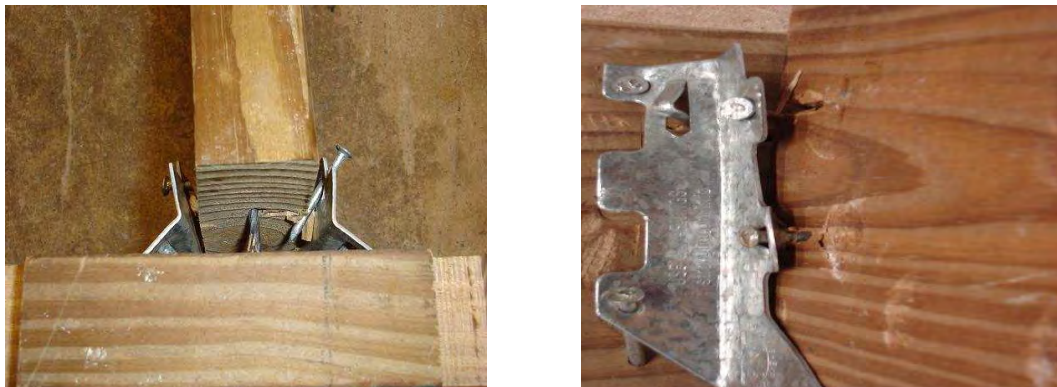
Failure mode for roof-to-wall connections in dynamic load tests
